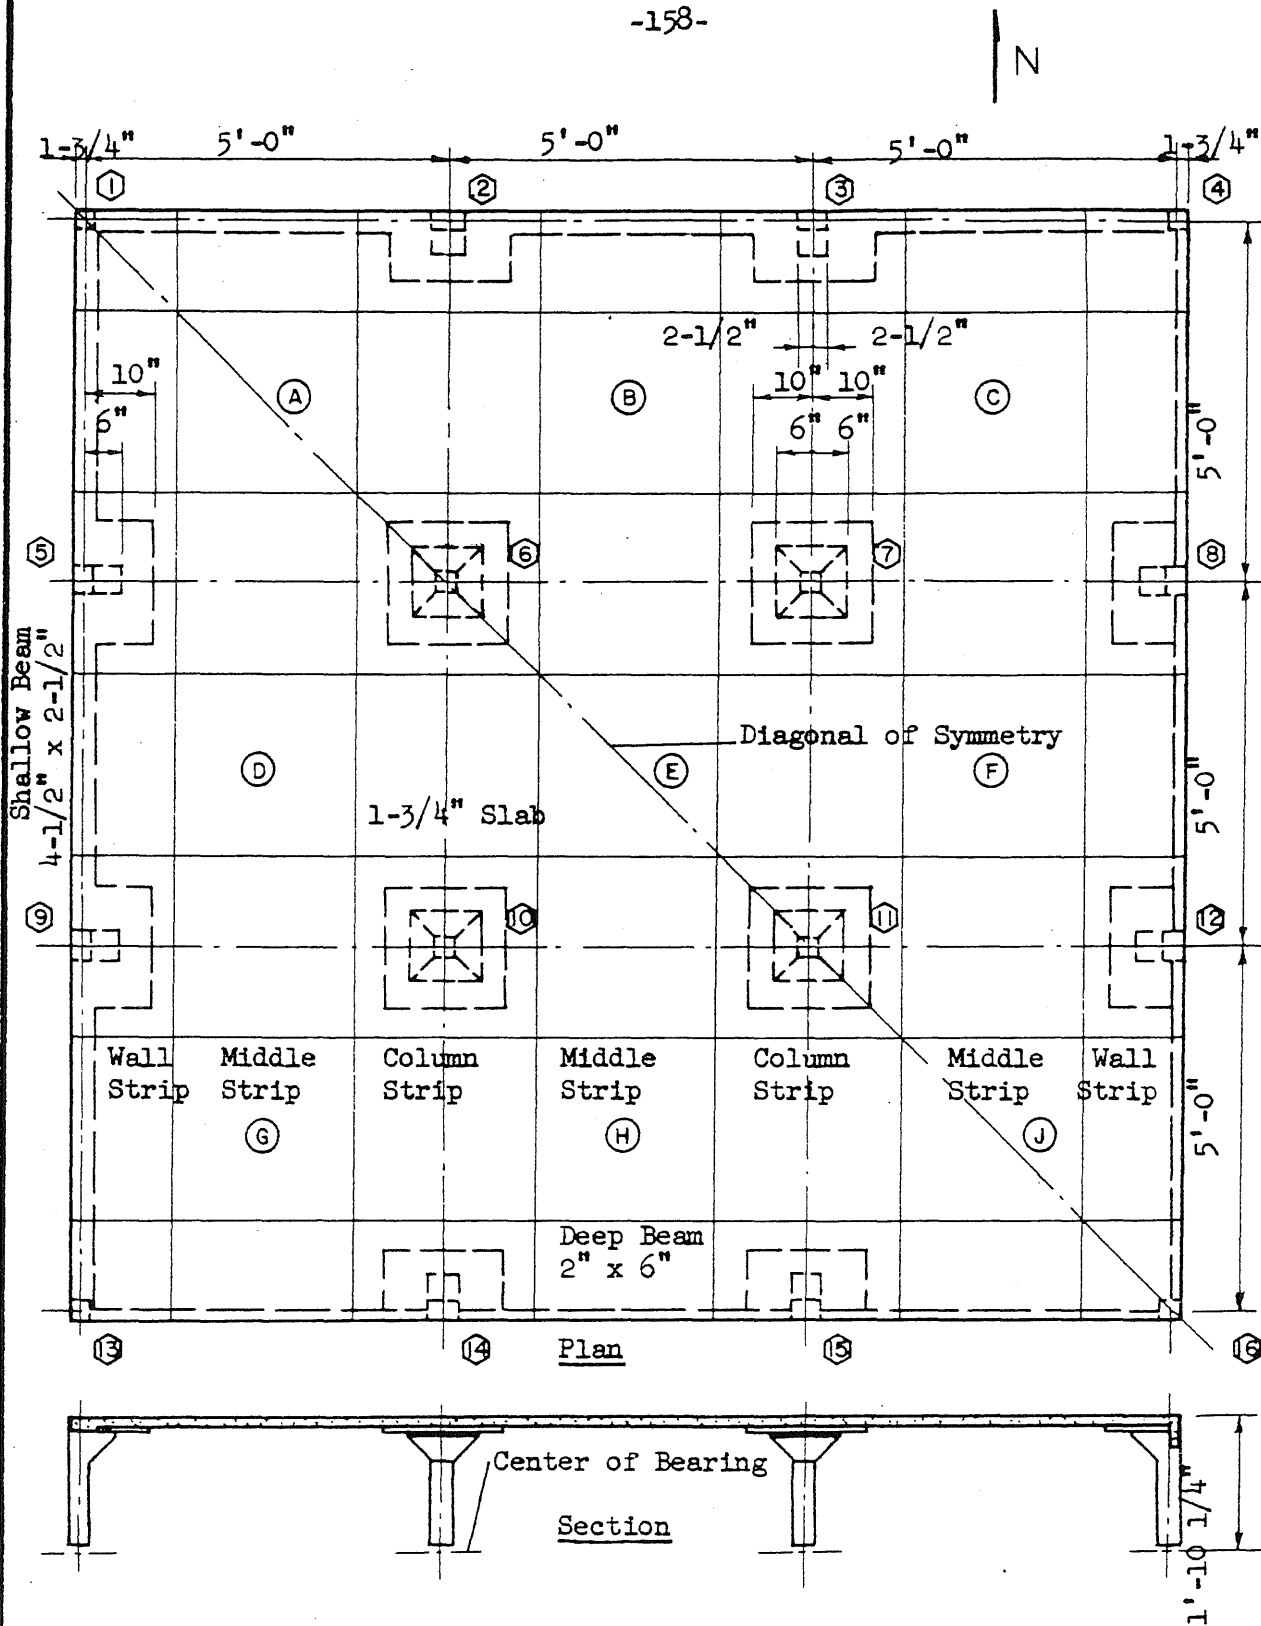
LAYOUT OF FLAT SLAB TEST STRUCTURES (F2, F3)
